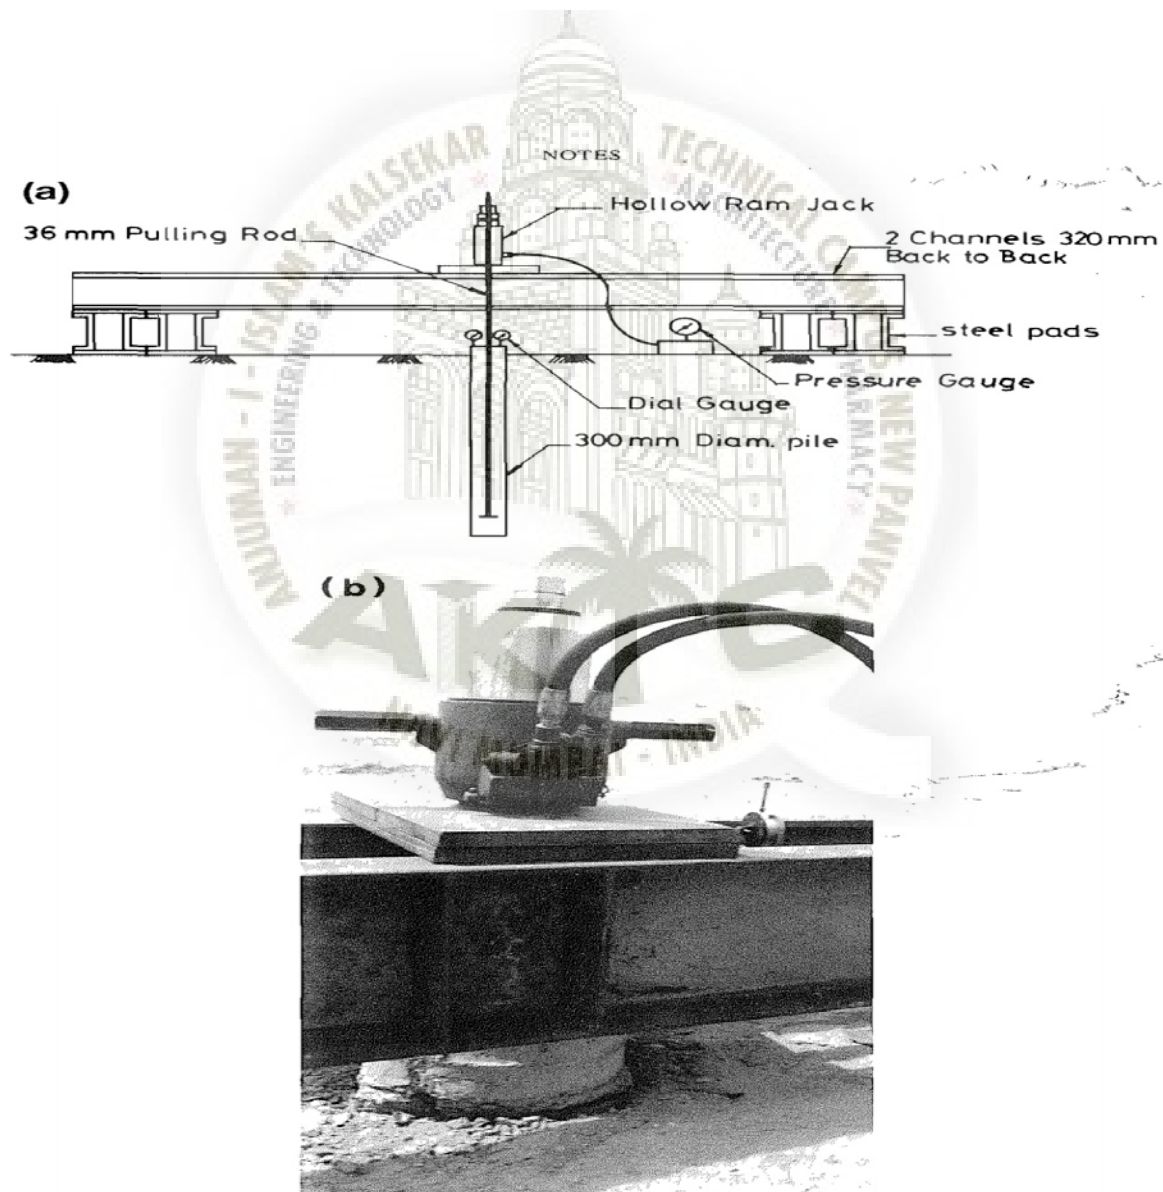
a) Tension test setup. b) after failure view of 3.3m long pile
